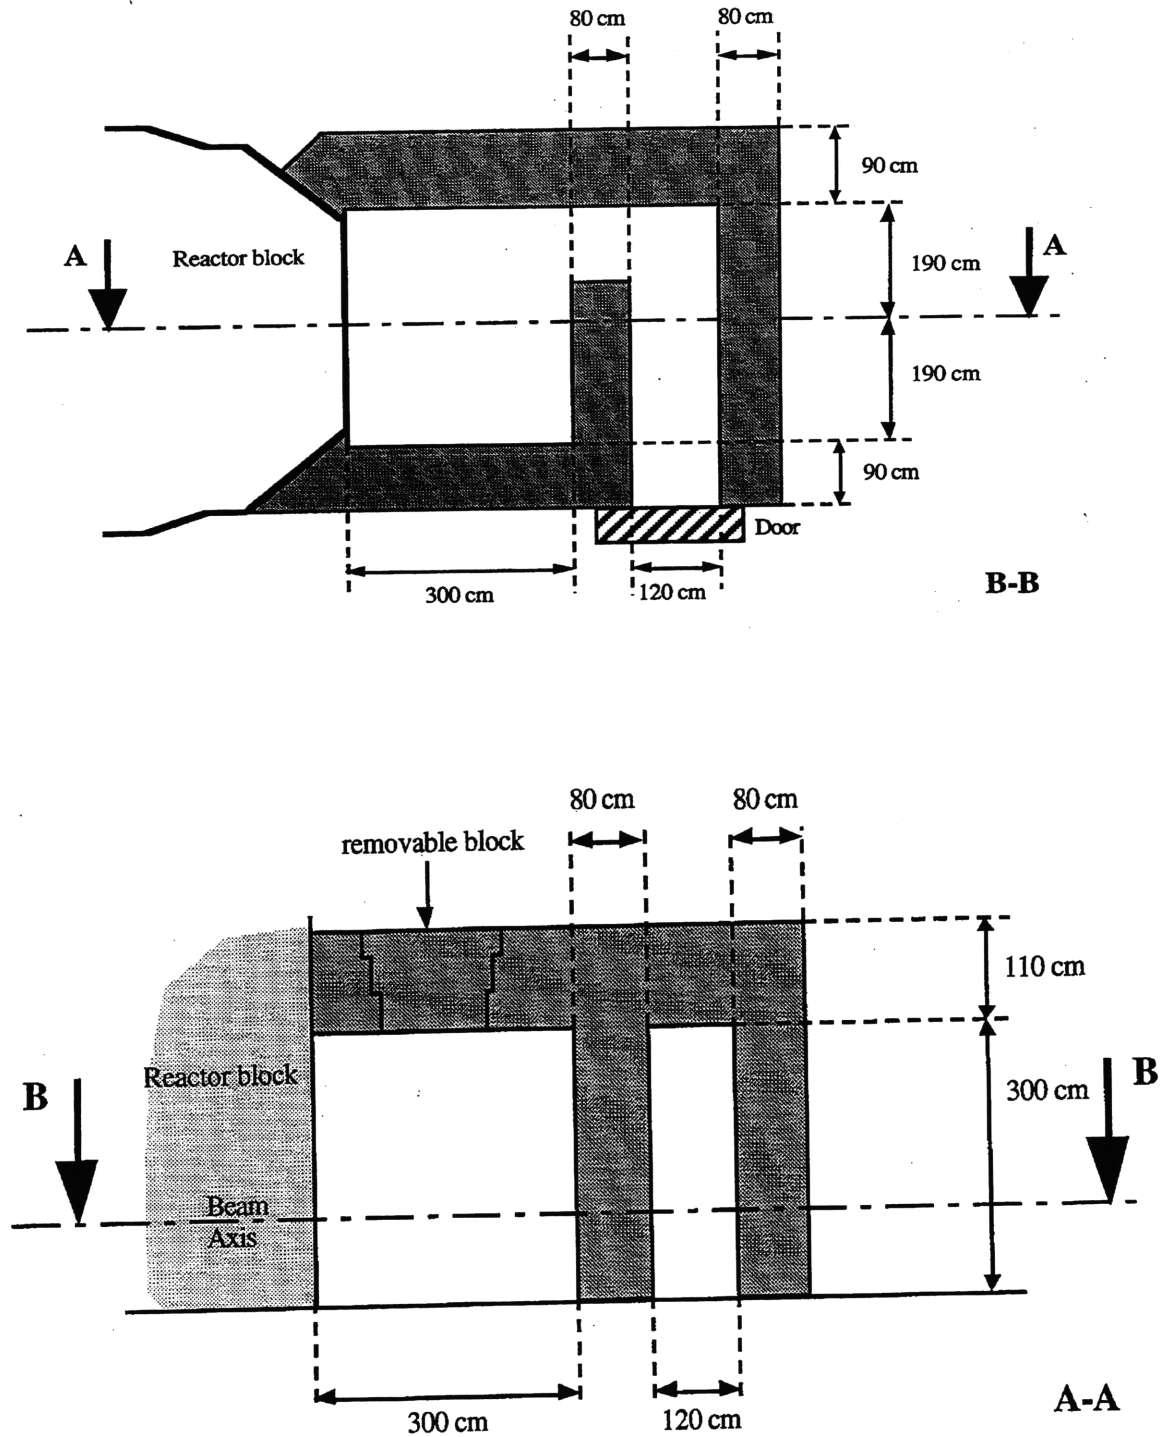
Preliminary Medical Room Layout, showing plan and side views (Courtesy of Anne Le Gal)
